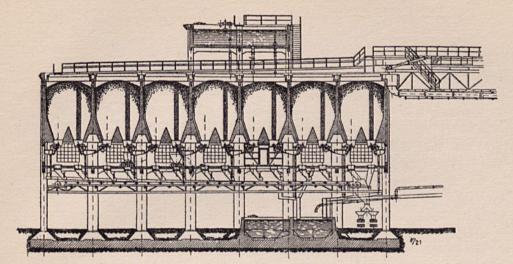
Section of Static Fine-coal Drainage Bunkers.
